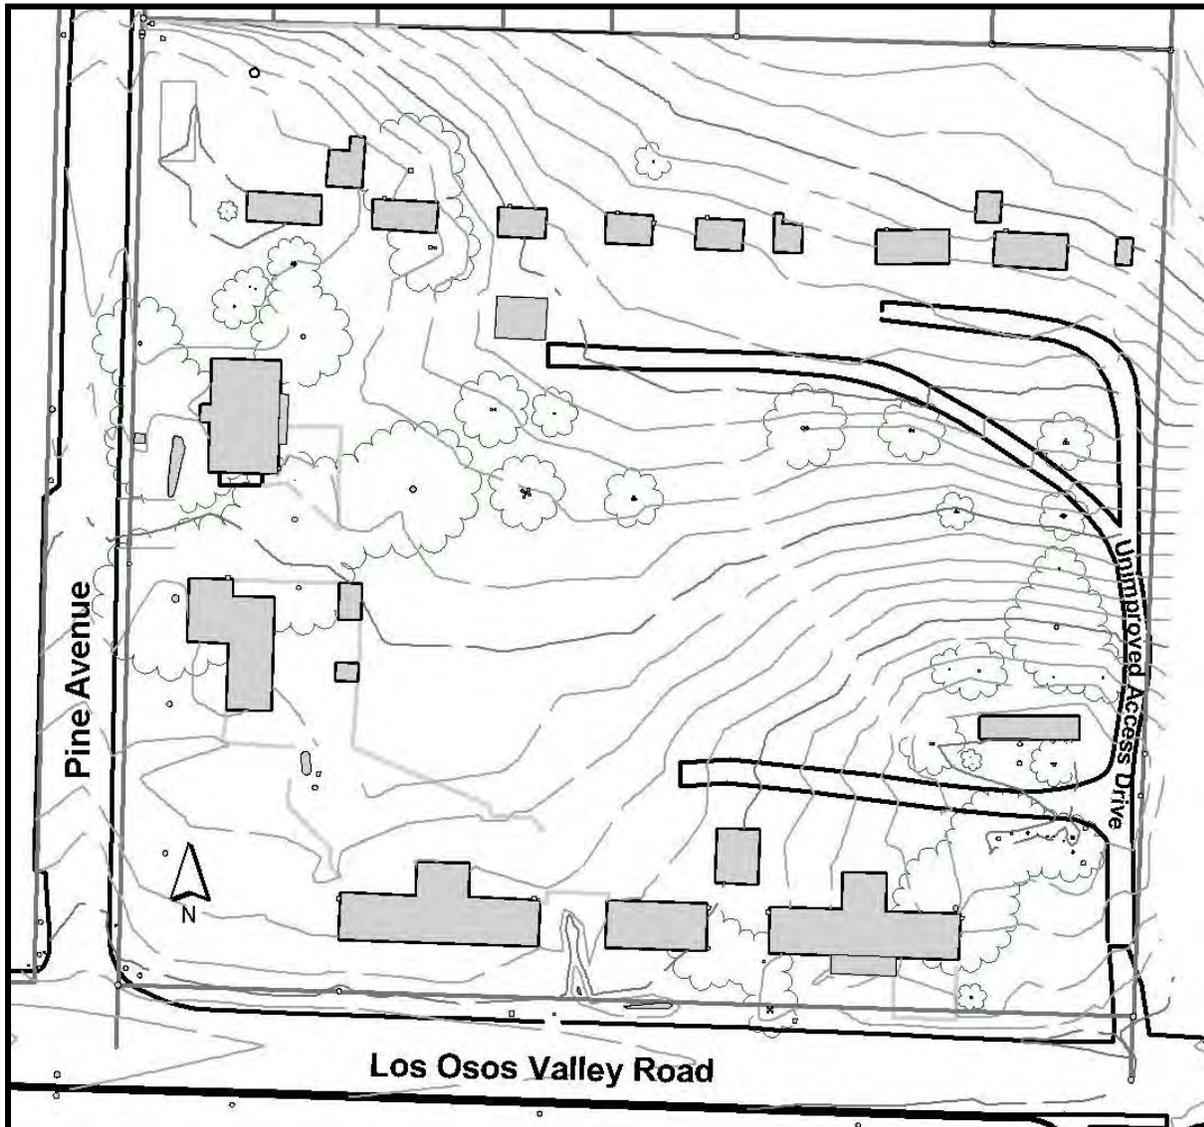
Engineer's drawing of HCP Plan Area showing topographic contours and the location/size of existing improvements (residential structures, outbuildings, fences, trees, etc.) (Hodge Company, 2008).
